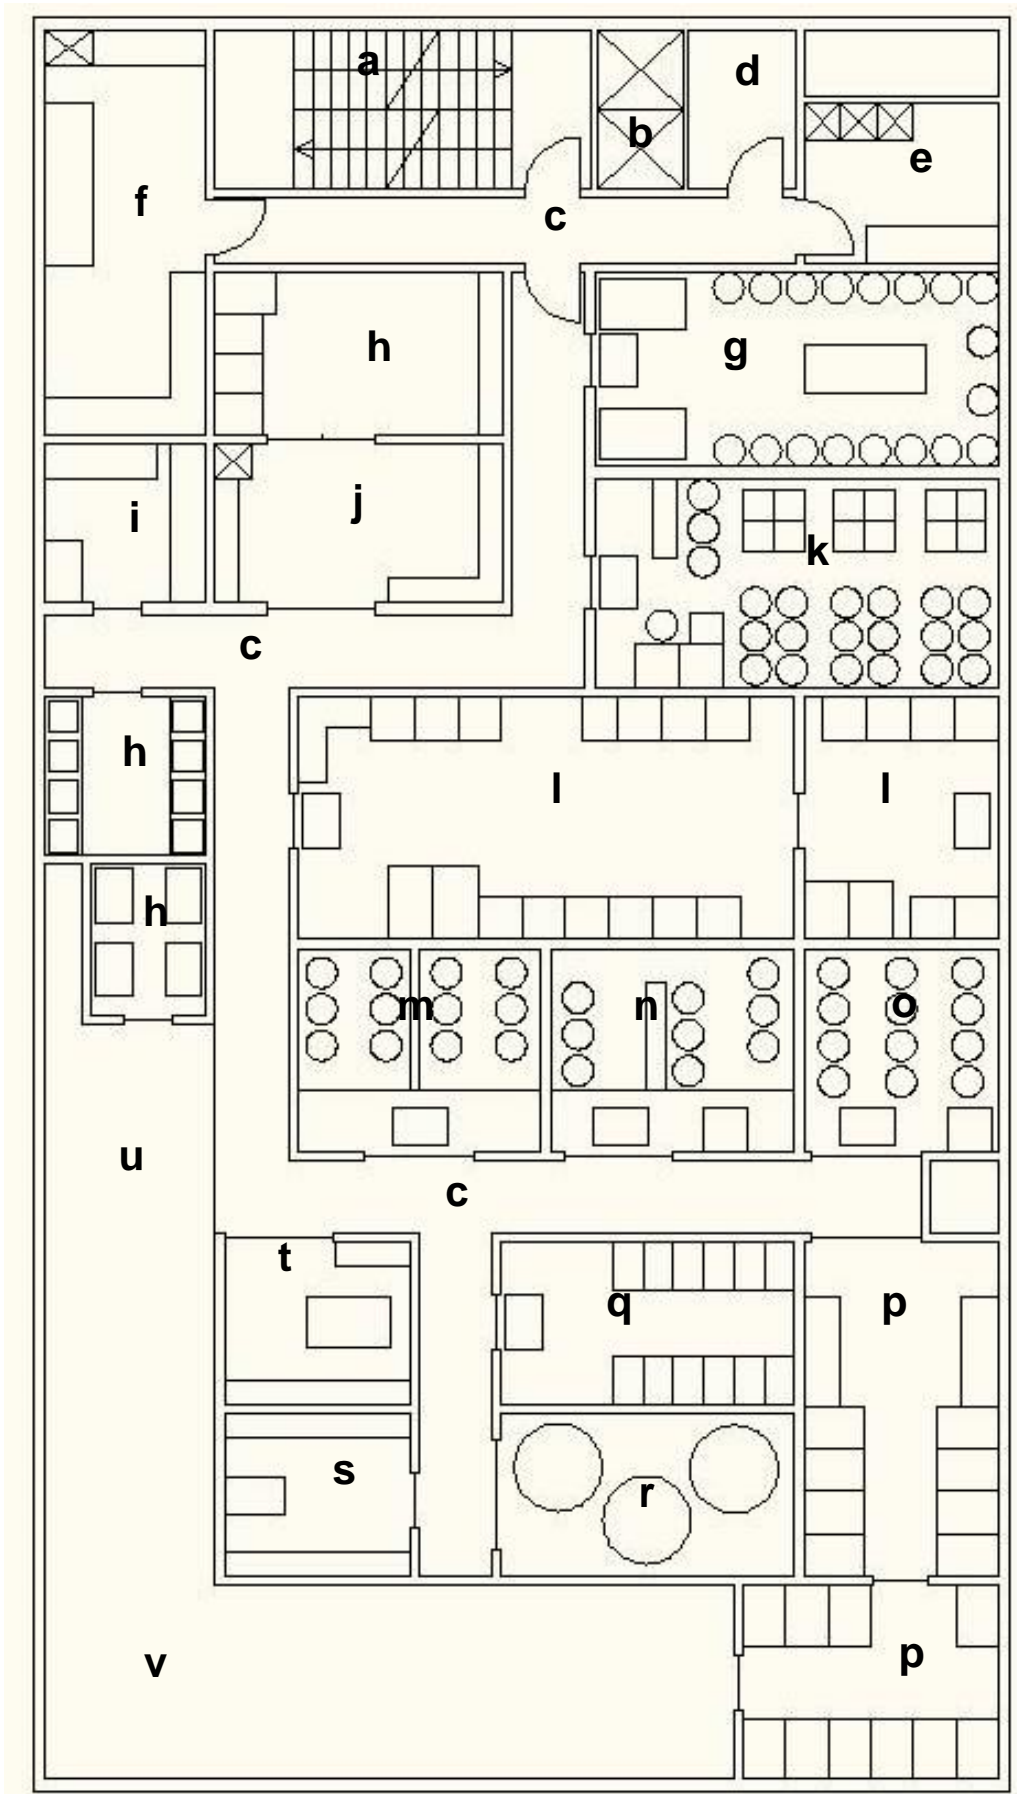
First floor plan: a) stairs; b) Lifter; c) Corridor; d) Bathroom; e) Mortaliities storage room; f) Aquaculture office; g) Bay 1; h) New Bays in construction; i) Bay 11; j) Bay 12/ Biotechnology lab; k) Bay 2; l) Bay 3; m) Bay 4; n) Bay 5; o) Bay 6; p) Bay 7; q) Bay 8; r) Water reservoirs; s) Bay 10; t) Bay 9; u) Cleaning area, NaOH preparation room and feed stored room; v) Tools storage room (AutoCAD 2010®, Architecture).
